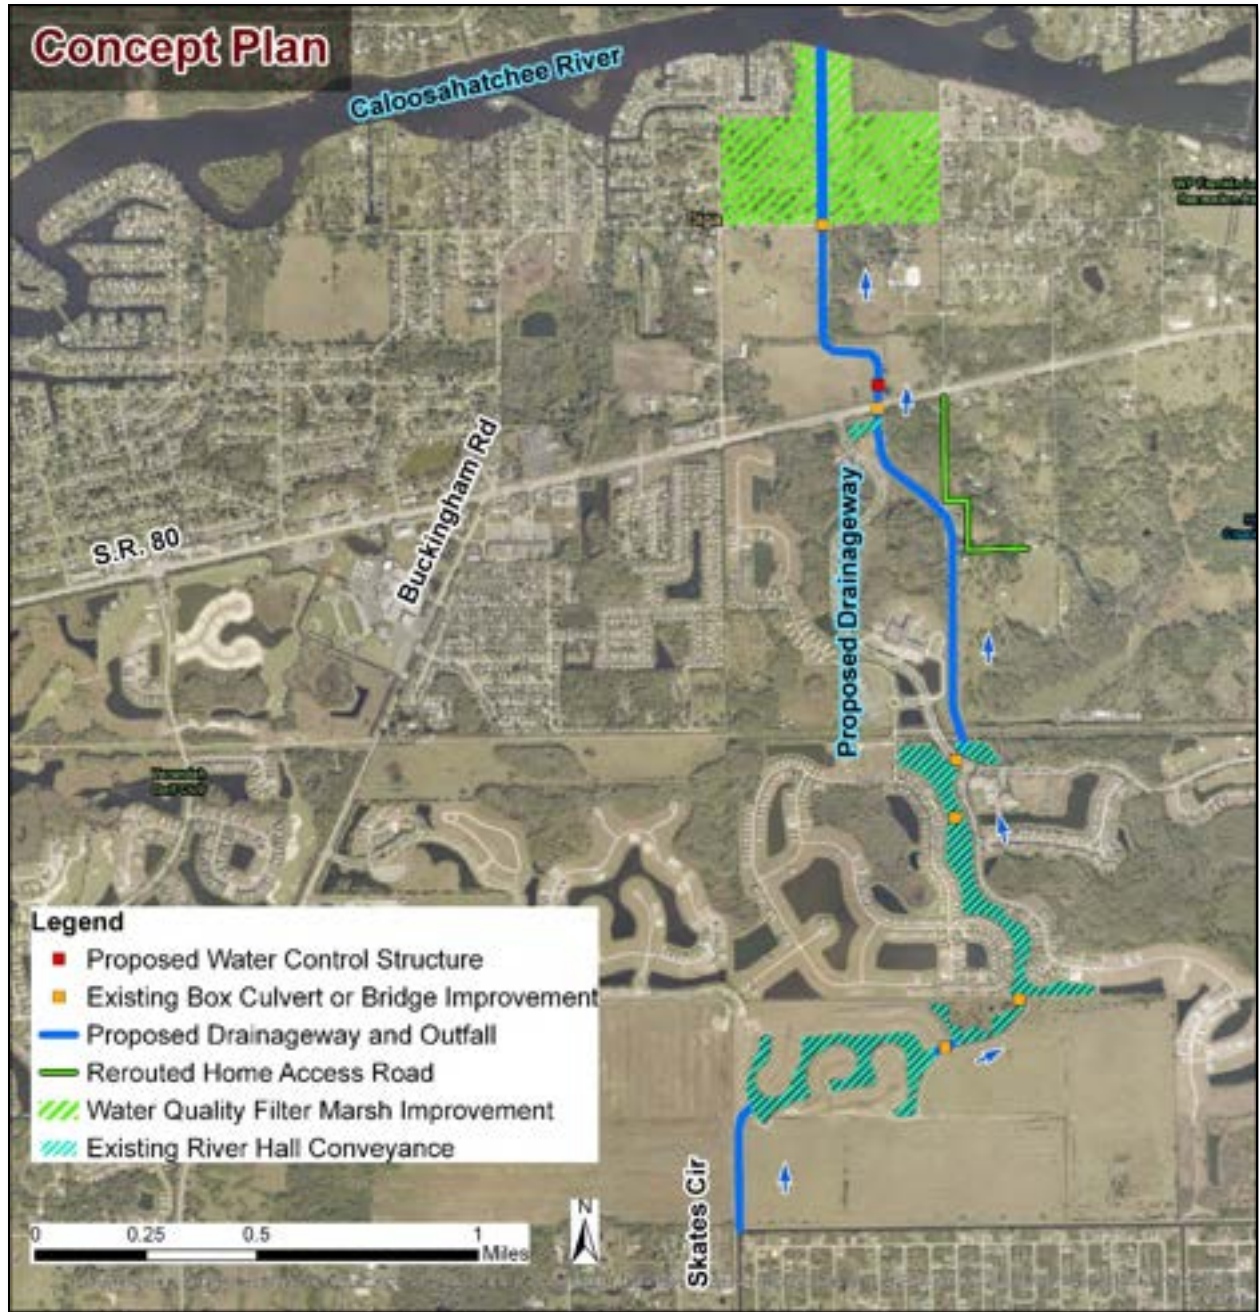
Concept Plan, 1.1.6 Lehigh-River Hall to Olga Outfall
